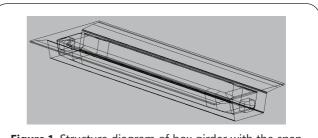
Structure diagram of box girder with the span of 39.1 m.
